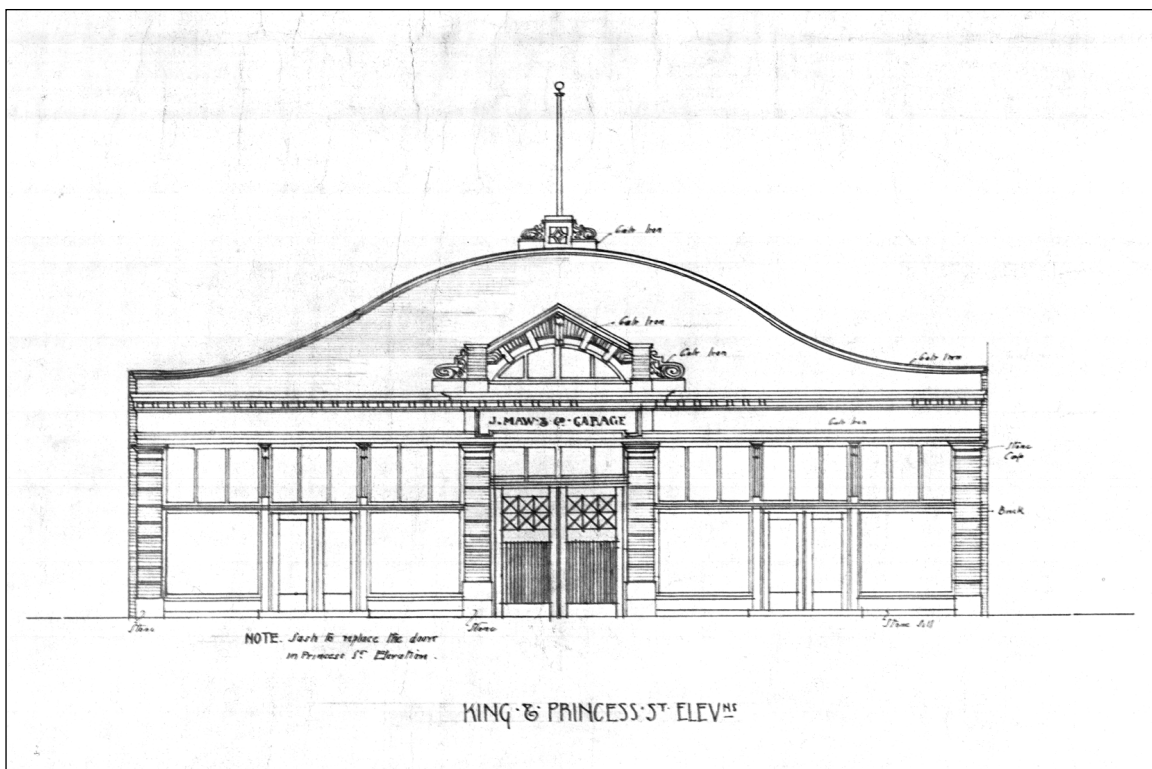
“King & Princess Street Elevations,” architect’s plans #176/1907. (City of Winnipeg, Records Management Division.)
